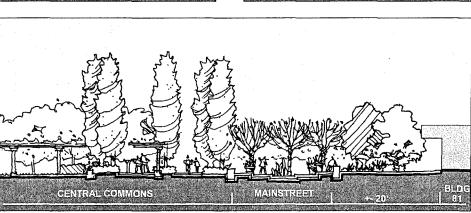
(NEAR RIGHT) Section of the Pedestrian "Mainstreet" at North Entry
